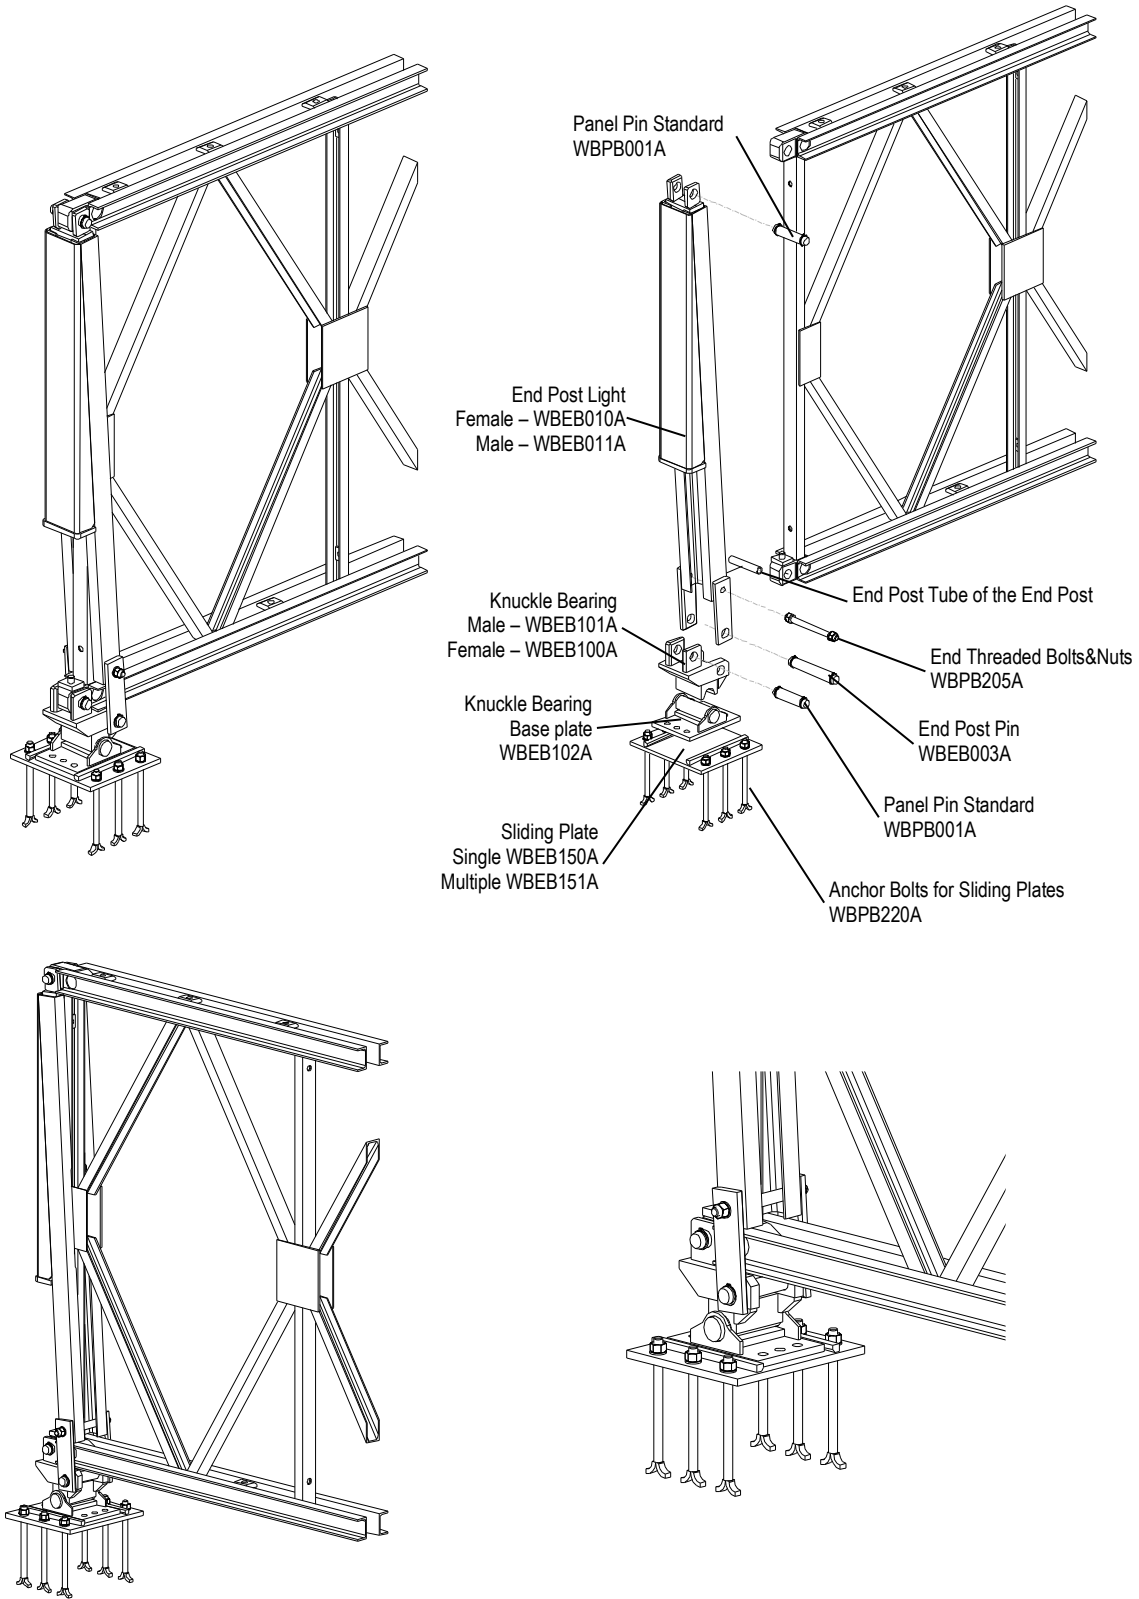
ENDPOST AND BEARING ASSEMBLY
